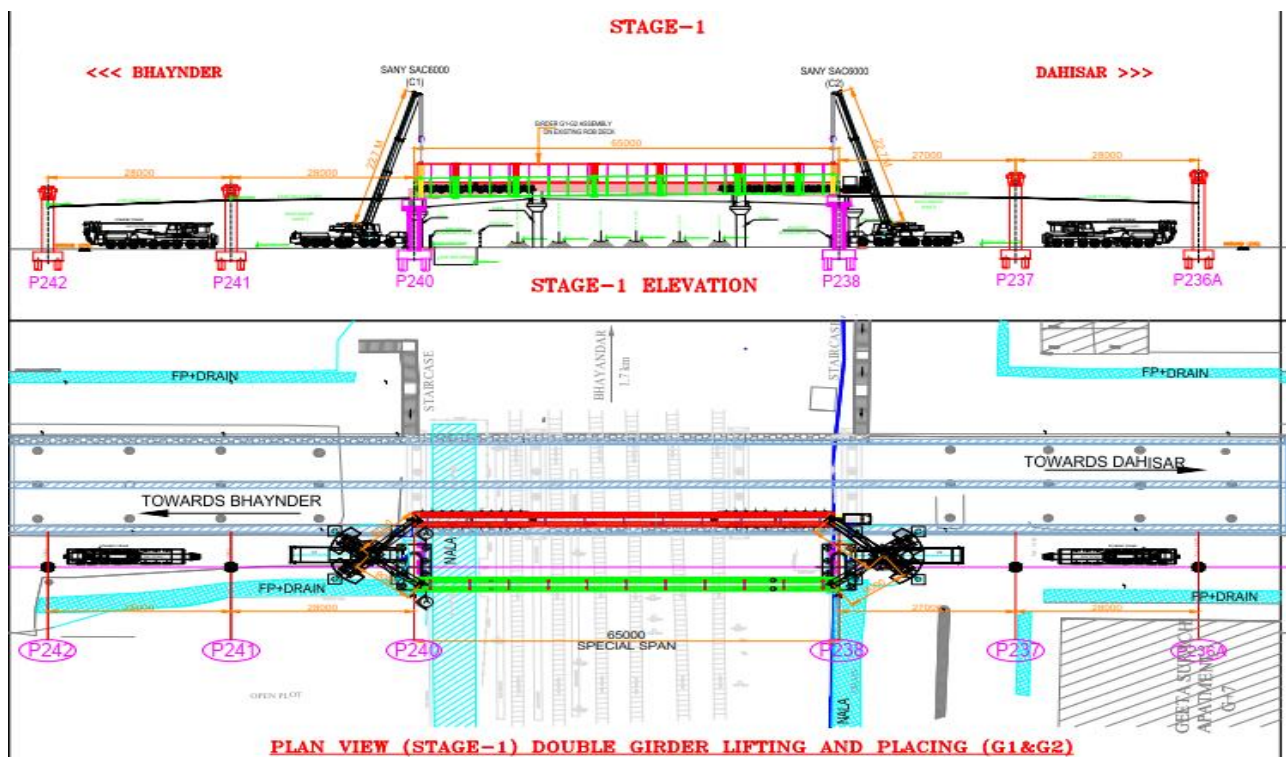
lifting Plan for Stage-I Steel Girder
